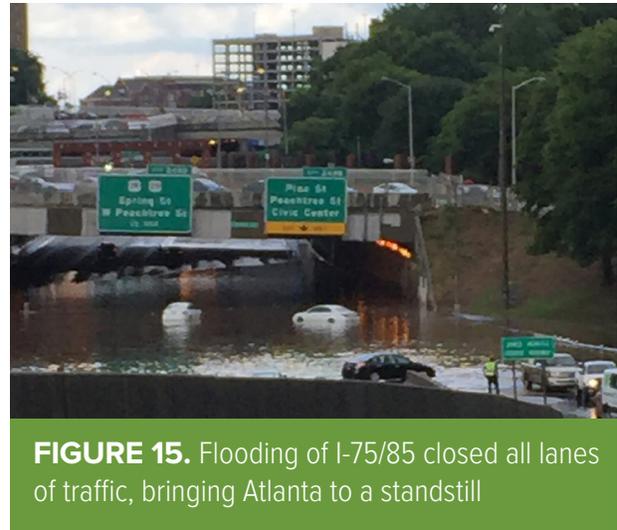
Flooding of I-75/85 closed all lanes of traffic, bringing Atlanta to a standstill
